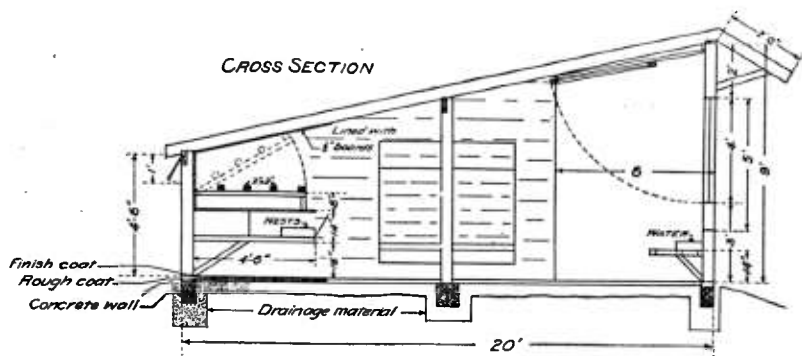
Cross section showing construction of house in figure 7, with a double wall around the droppings board. This plan shows a concrete floor; the house shown in figure 7 has a wooden floor.
